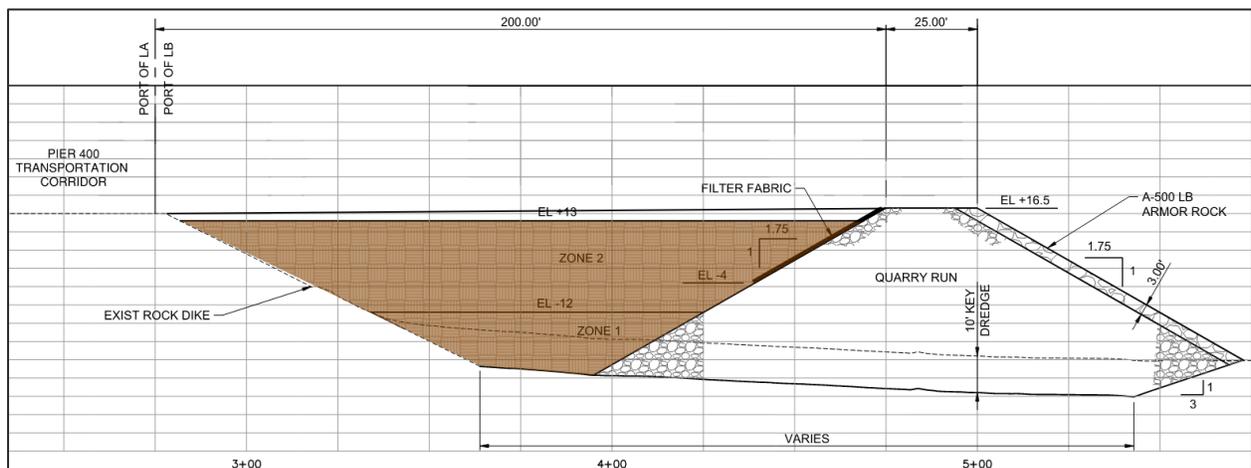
Pier Wind Transportation Corridor Fill and Dike Cross Section
